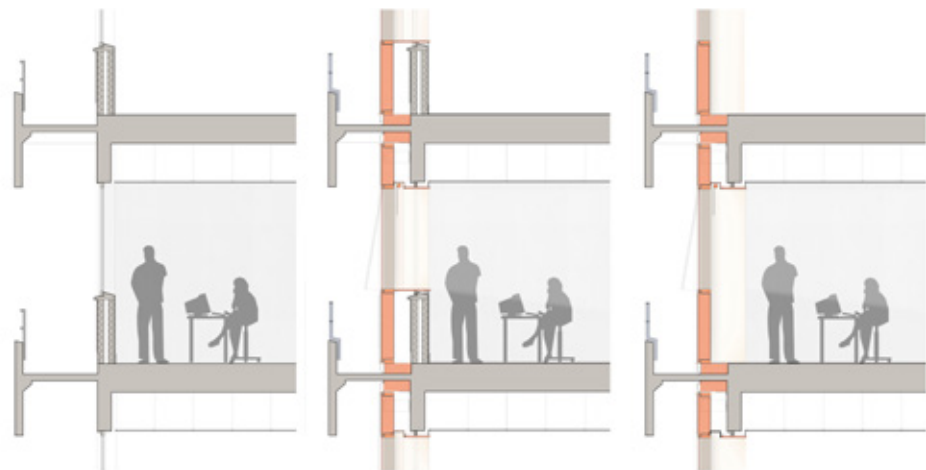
The overcladding primarily comprises folded dark grey anodised aluminium rainscreen panels with pale umber anodised aluminium curtain walling and spandrel panels
